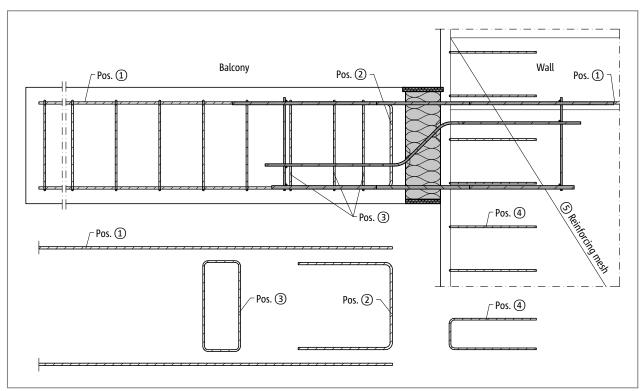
Schöck Isokorb® XT type B: On-site reinforcement
